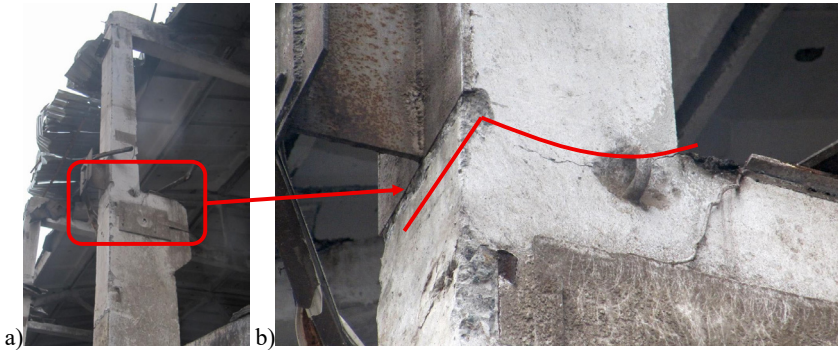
Destruction of prefabricated expanded clay concrete wall panels of a one-story frame building:
